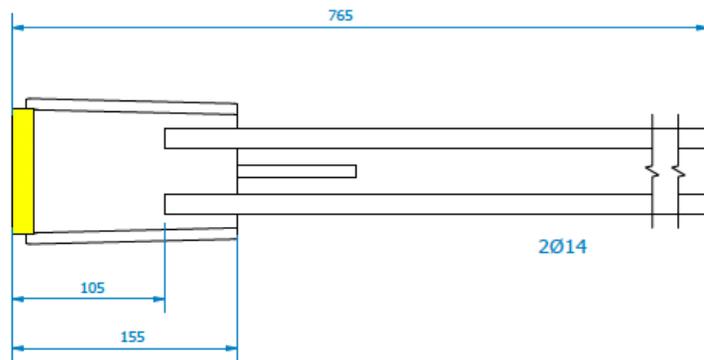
Examples of use: Case of connection to foundation and connection between columns
